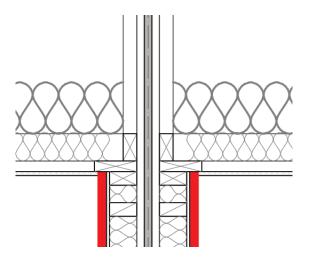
Intertenancy wall with cavity, vented into ceiling, which in turn would be vented to outside
